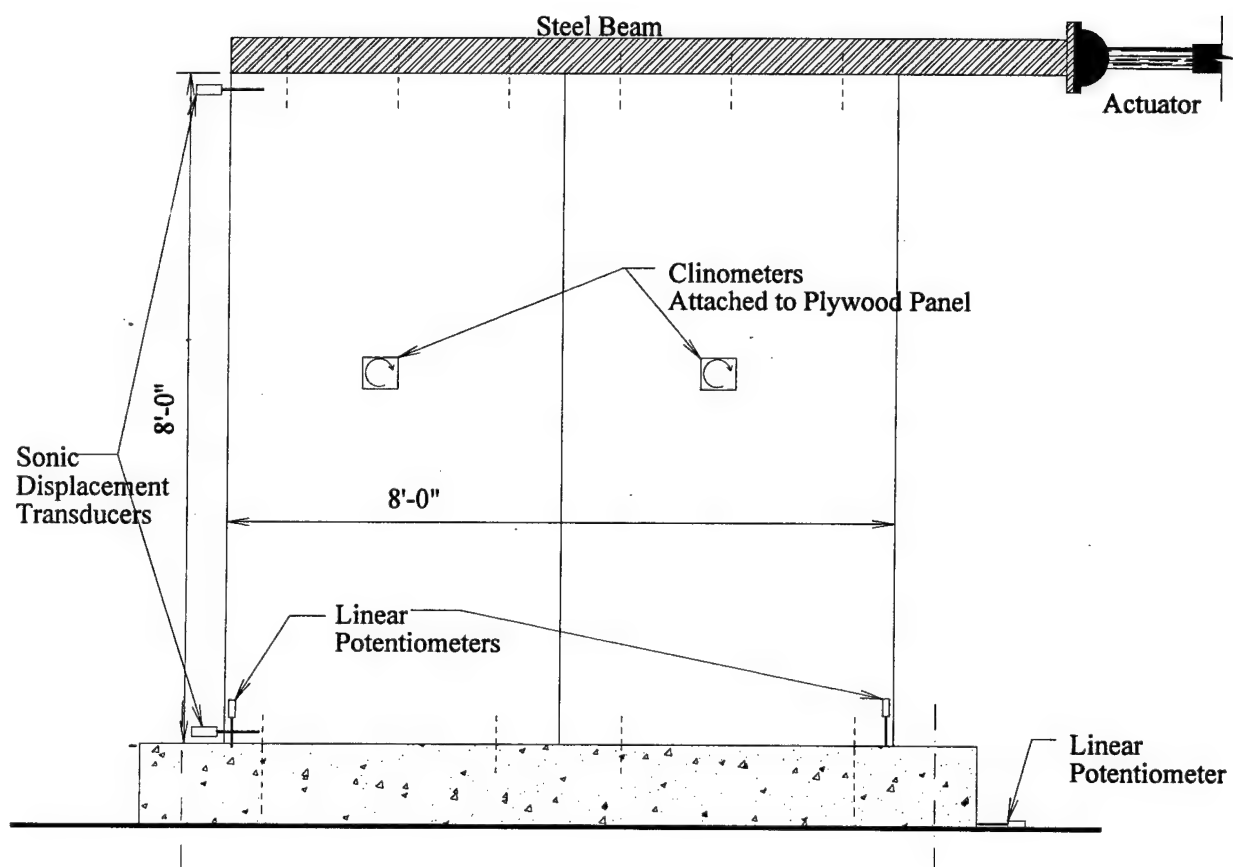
Experimental Test Setup: Task 2: Full Scale Plywood Shear Wall Testing
